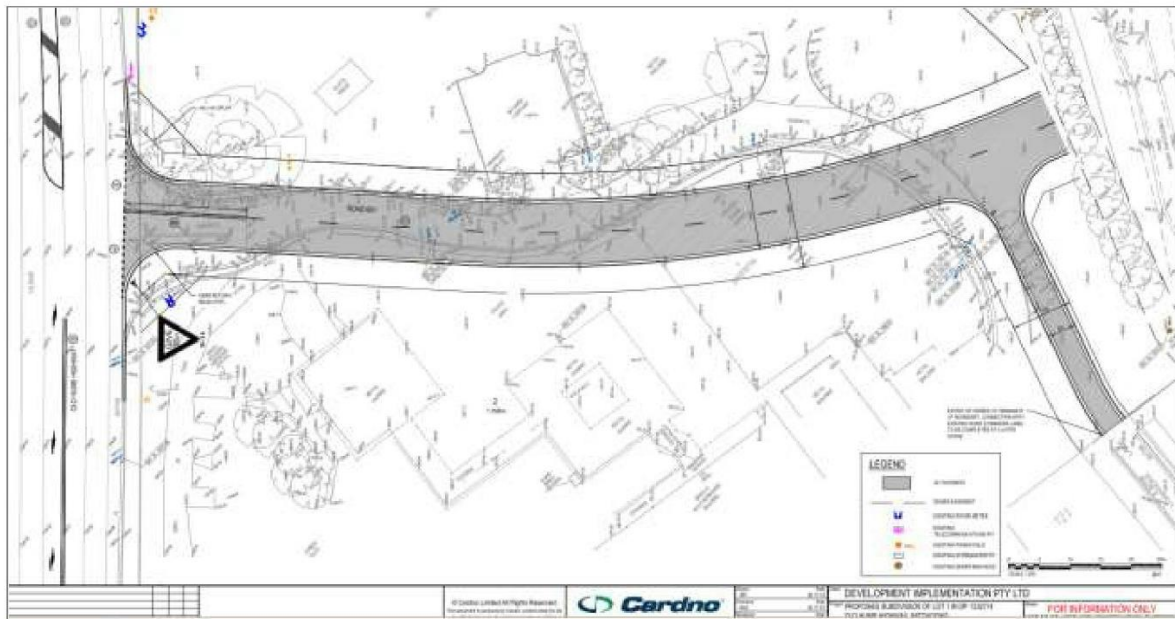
Approved road design concept of new entry road and Lomandra Lane extension approved in DA20/0340. (Attachment 5).
